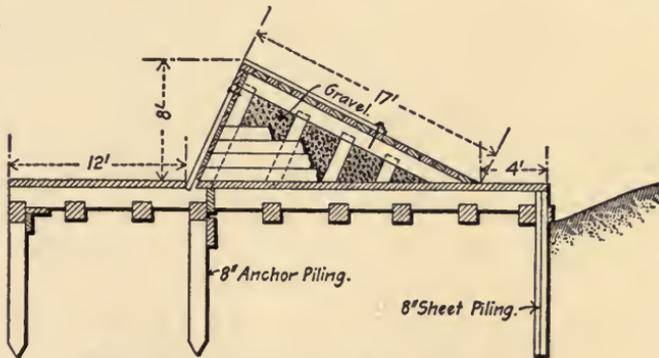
TIMBER WEIR ON STONY CREEK.
